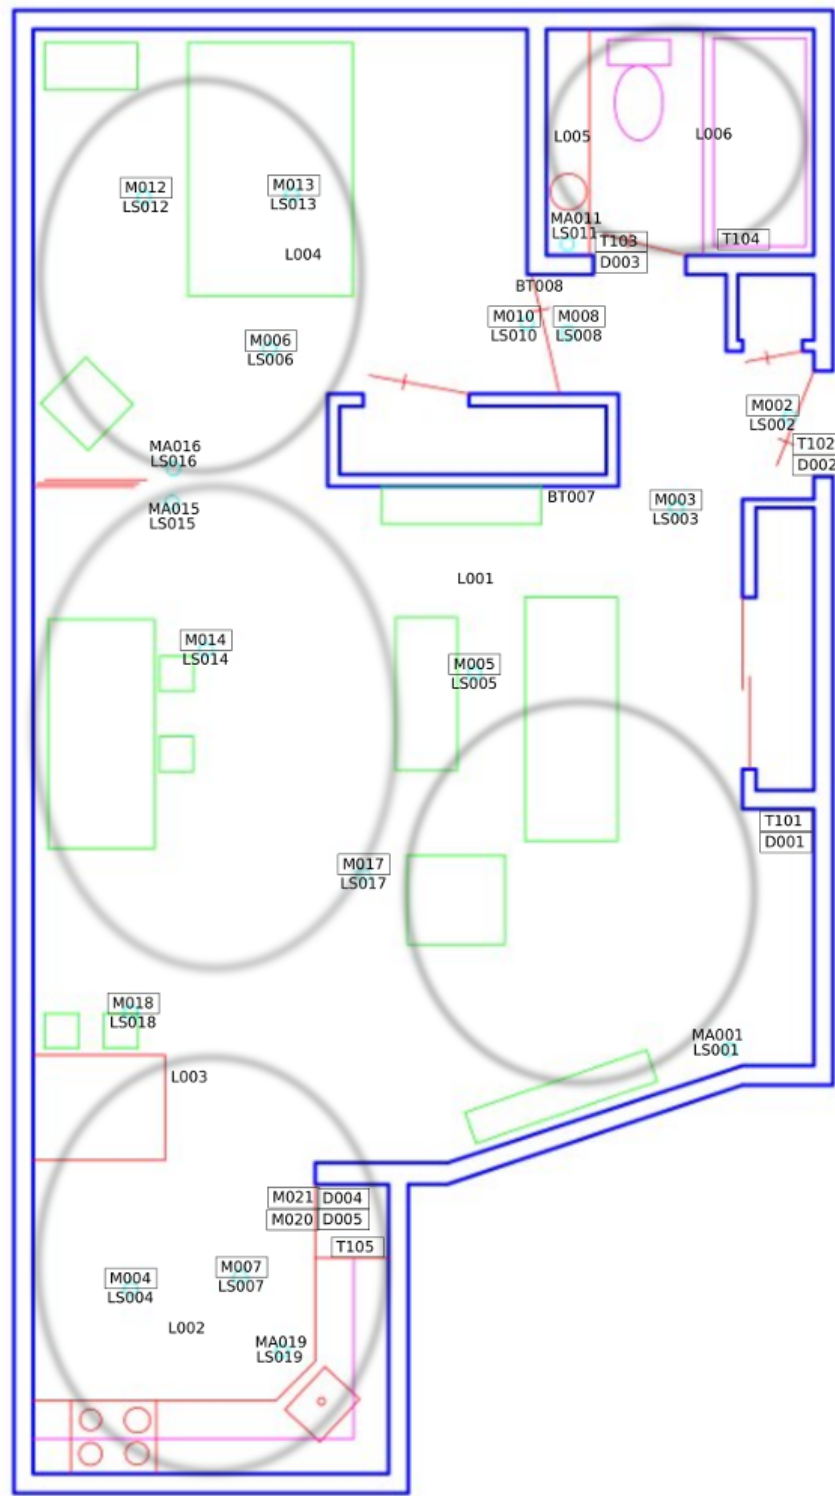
Floor plan and sensor placement for the testbed hh105.
